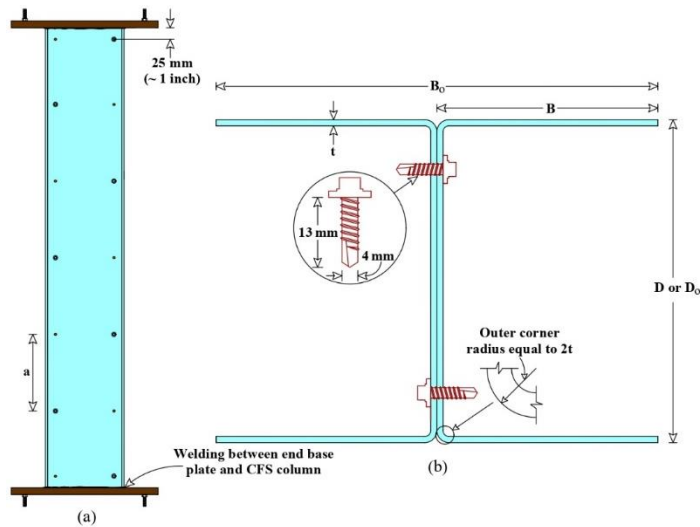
Built-up cross-section assembly: (a) View of test specimen; (b) Cross-sectional view of back-to-back connected cross-section
